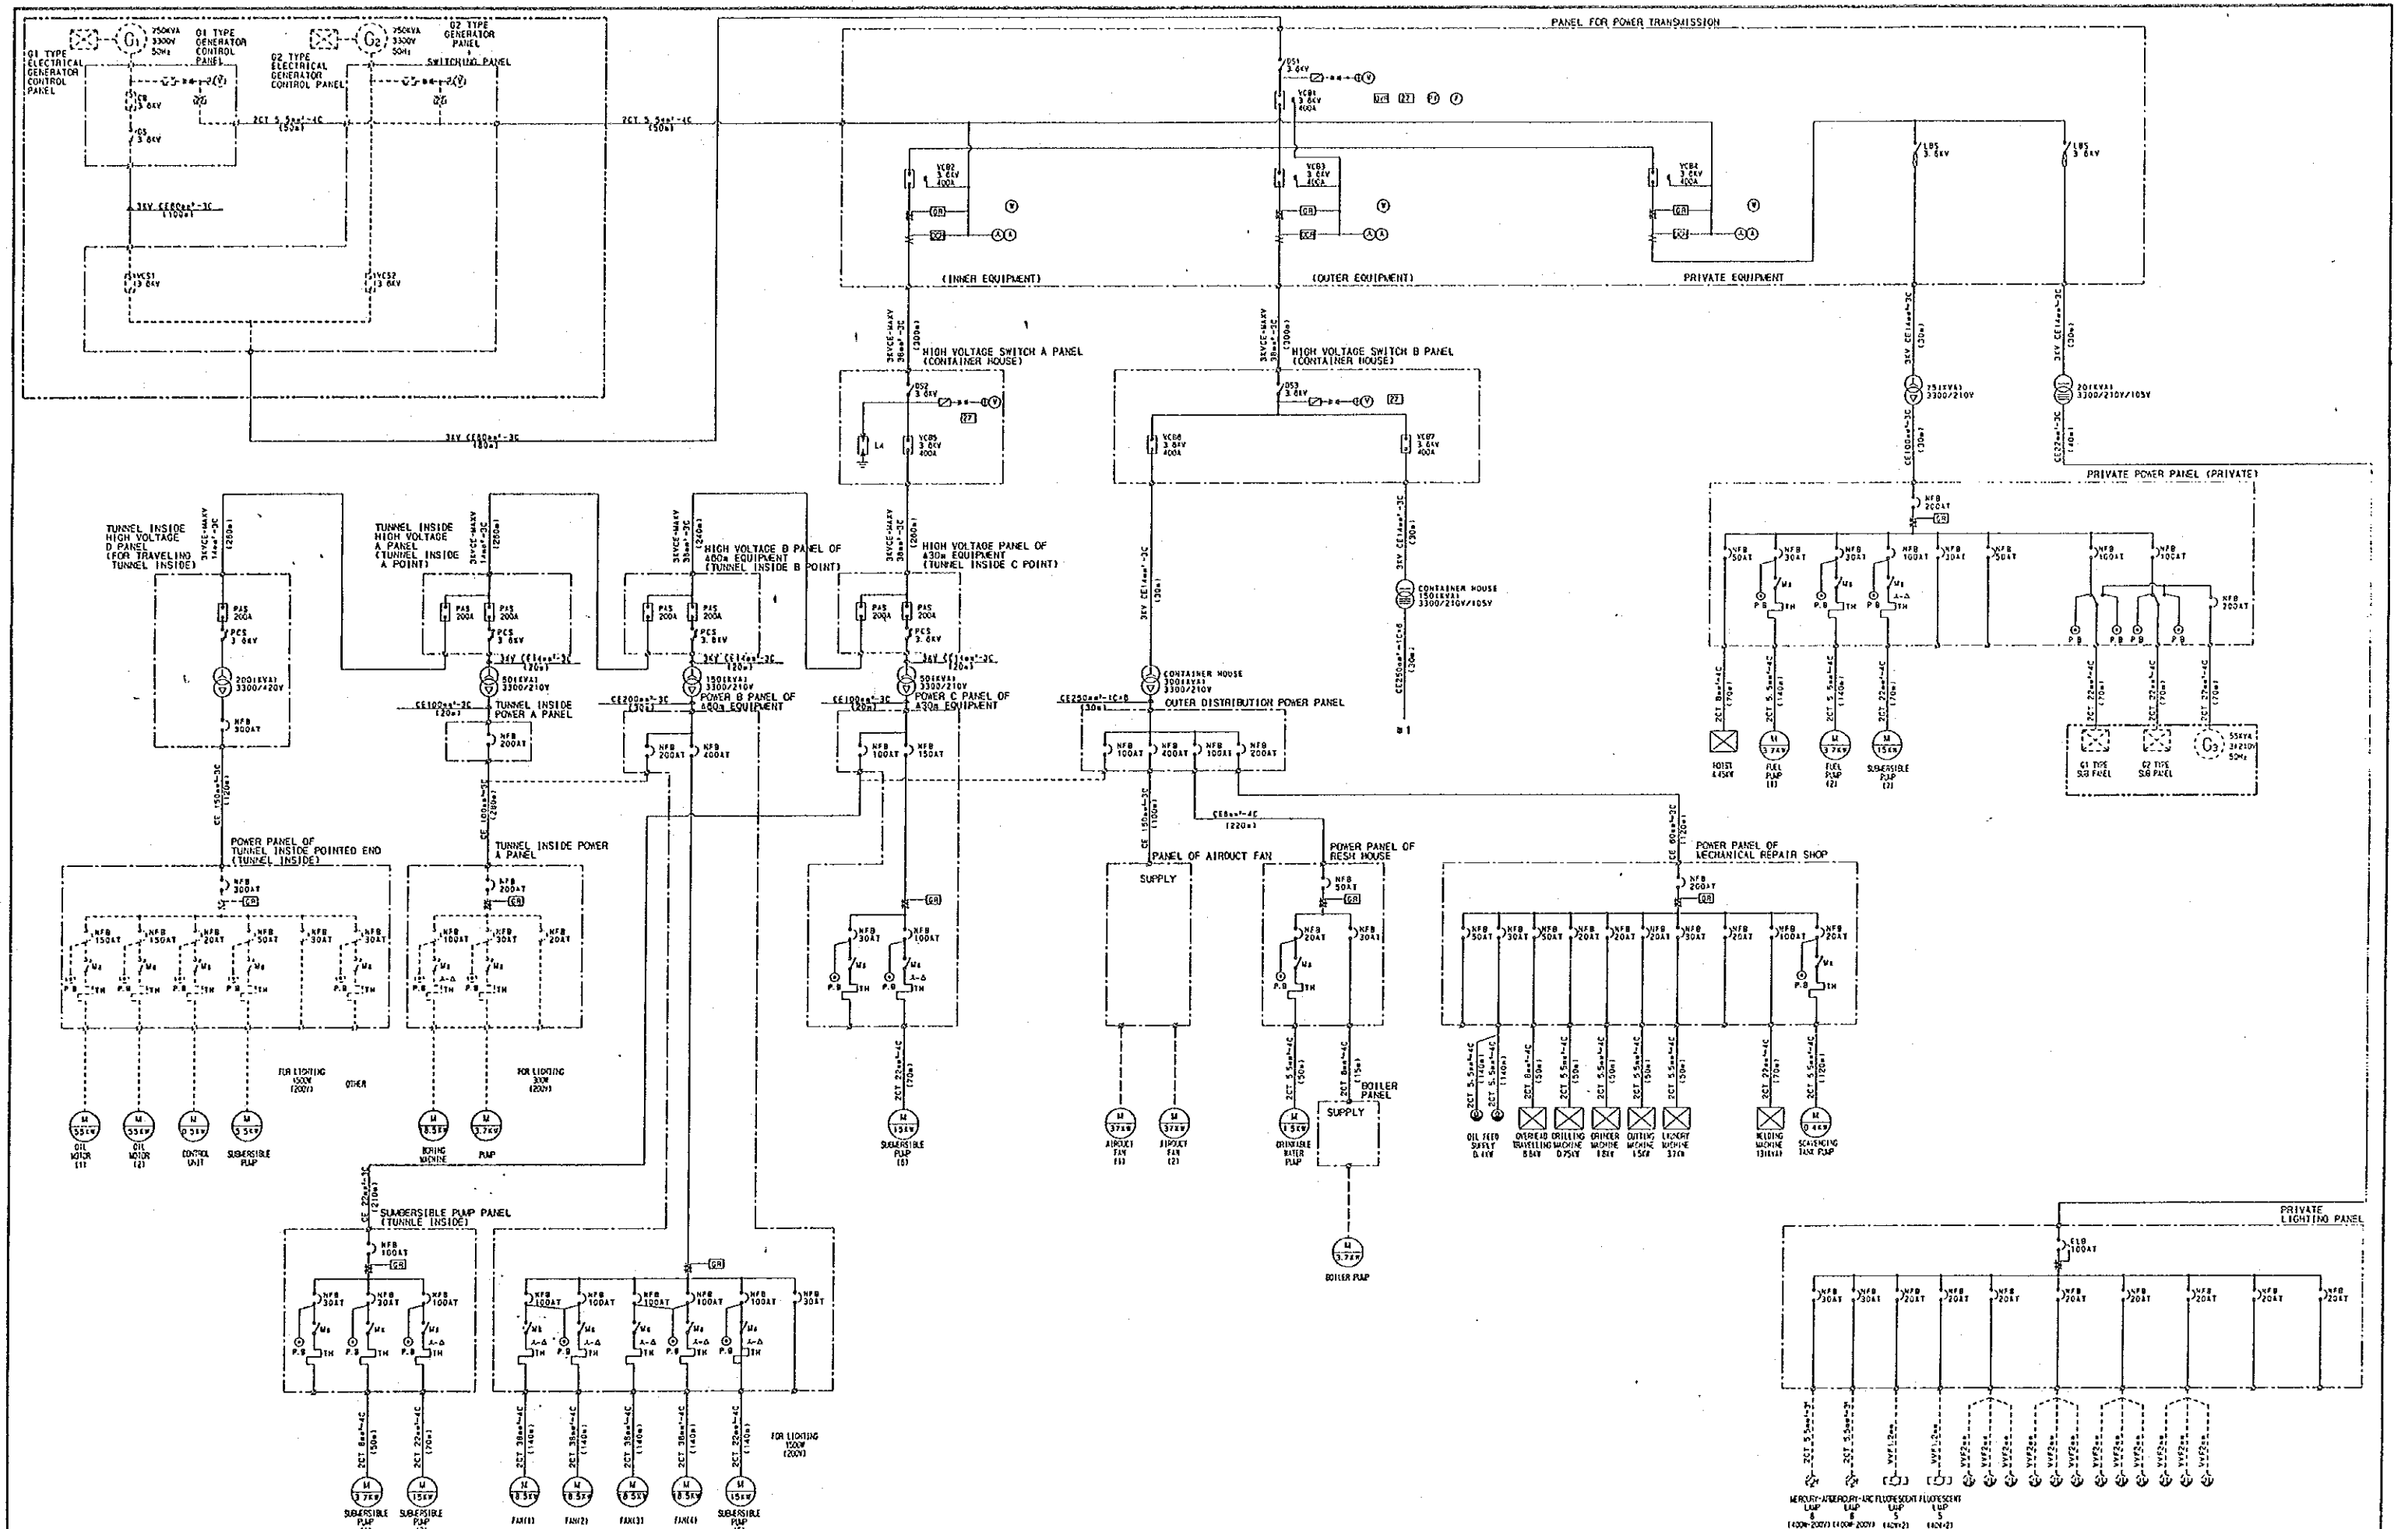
WIRING DRAWINGS ELECTRICAL CABLE (2)
